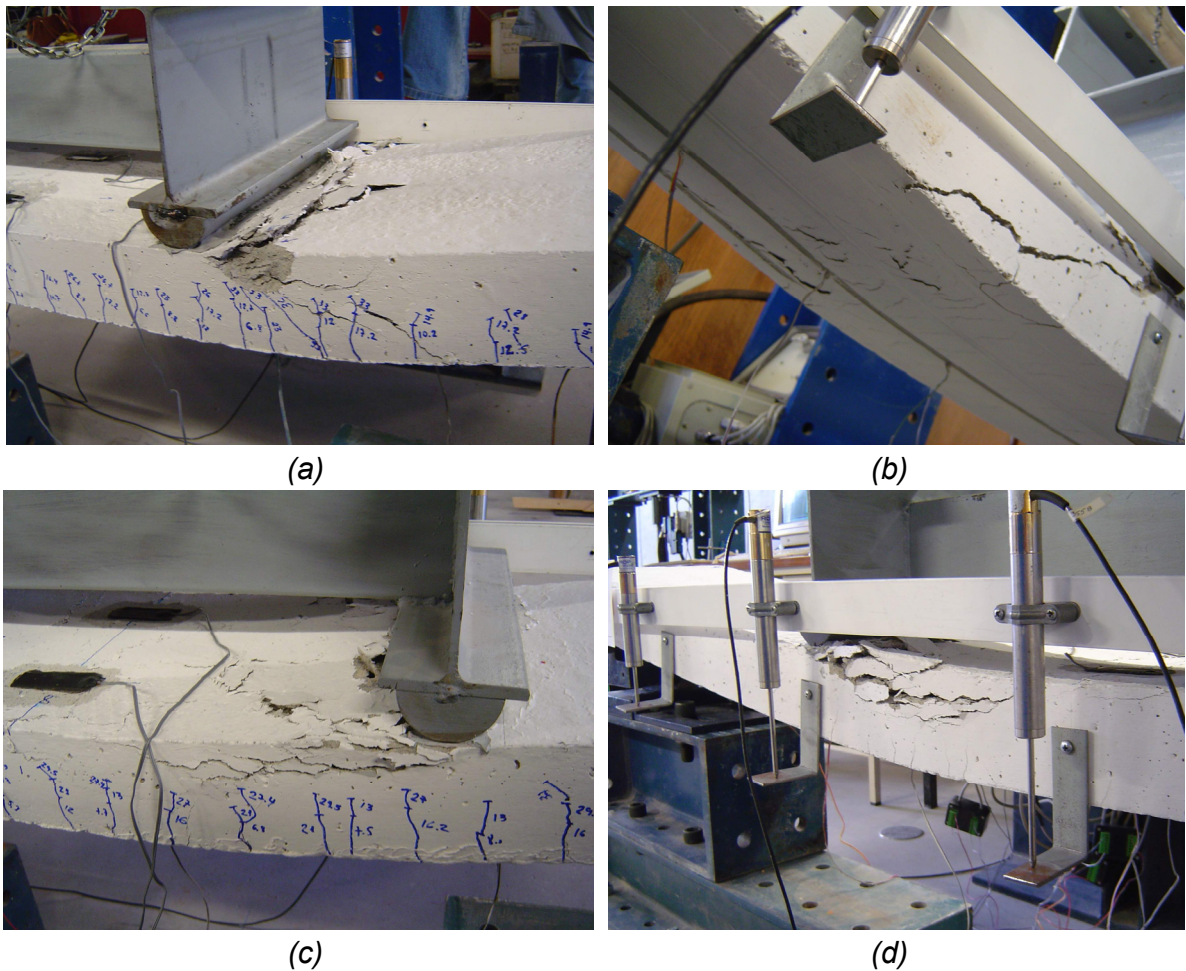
Failure mode of the unstrengthened slabs: (a) lateral view of cracking pattern and concrete crushing at the top of slab, and (b) bottom view of cracking pattern of slab SL1.
